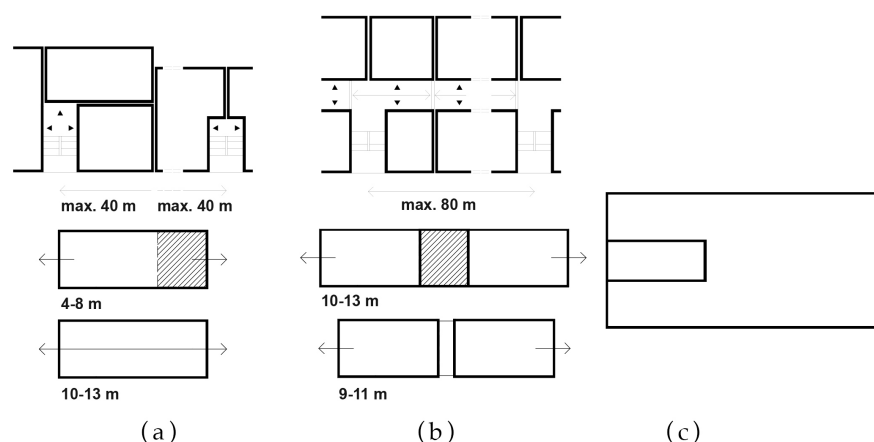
Building typology: (a) a single-staircase residential type; (b) a central-staircase residential type; and (c) an open-plan office type.
